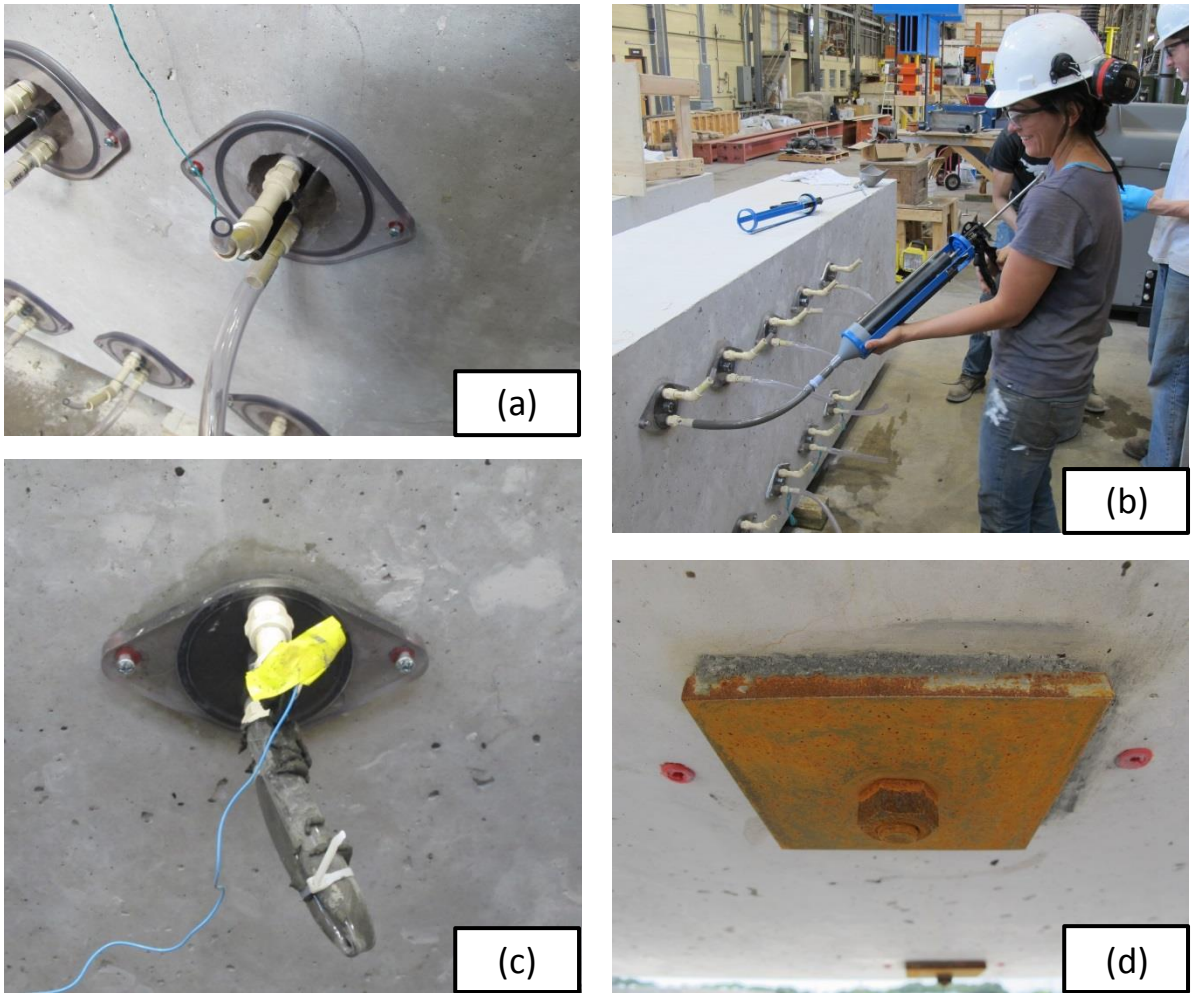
Grouting process. (a) faceplate fixture anchored to specimen; (b) grout injection; (c) seal fixtures after core hole is filled with grout; (d) mortared washer plate.
